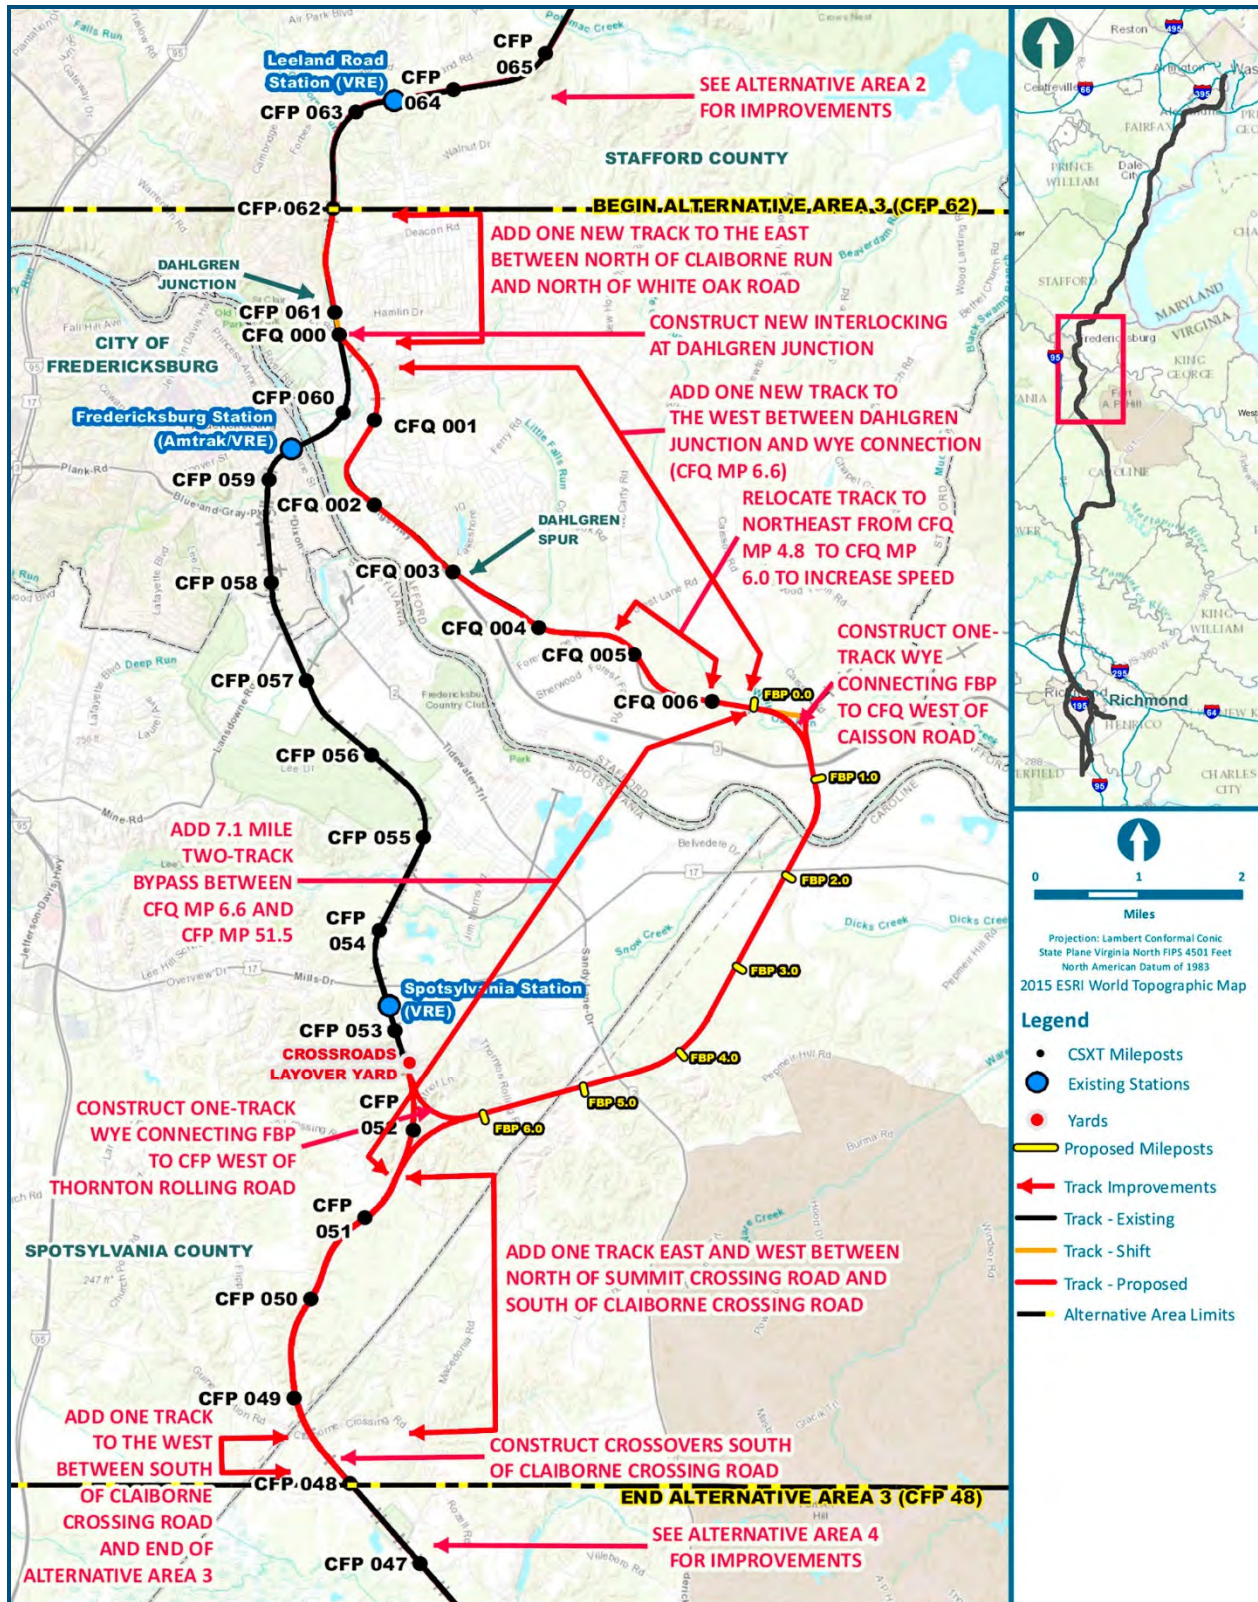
Build Alternative 3C – Add Two-Track Bypass East
